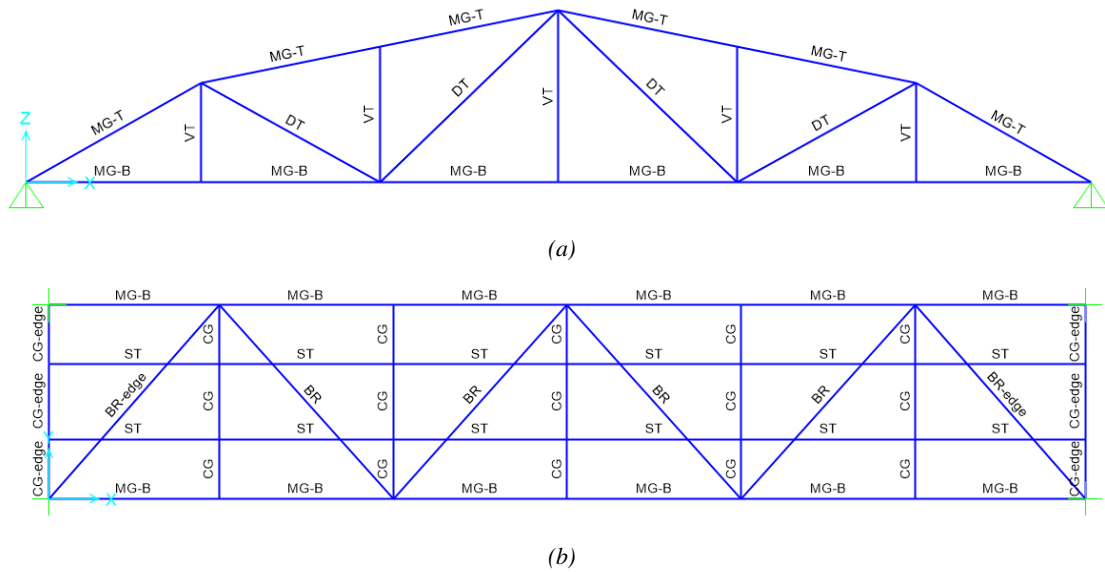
Sections of the bridge: (a) Truss girder and (b) Bridge deck
